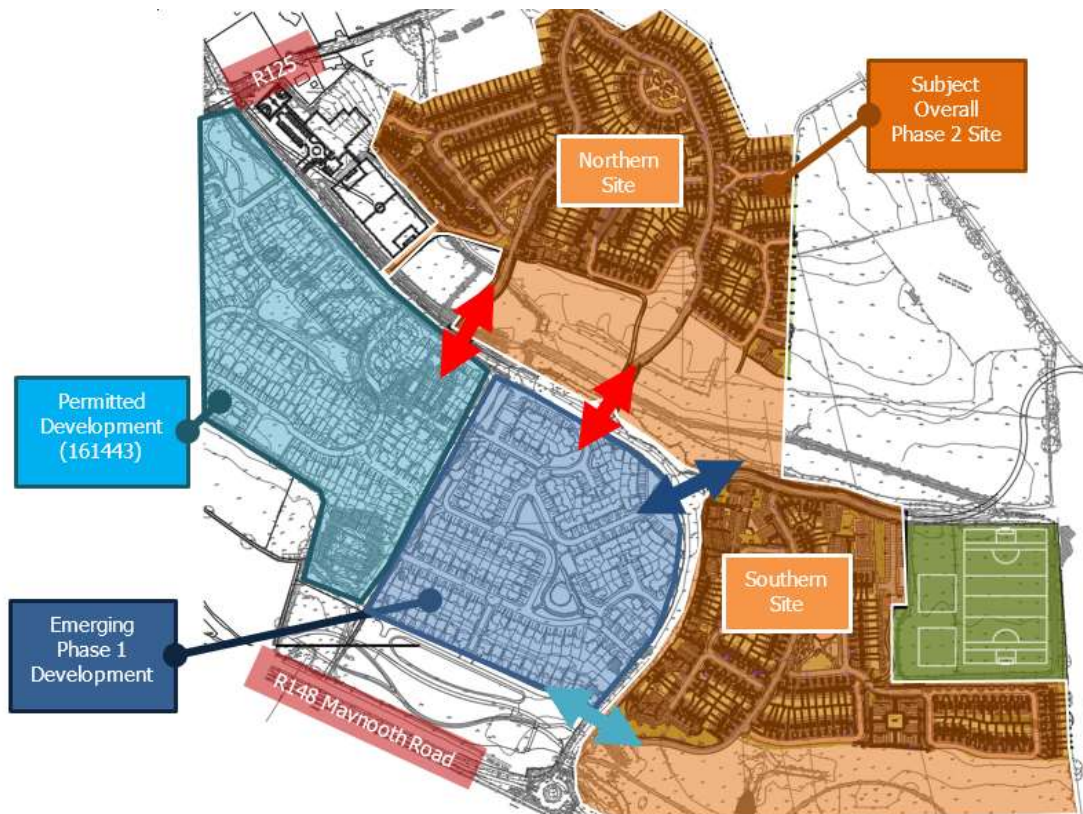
PROPOSED DEVELOPMENT SITE ACCESS LOCATIONS
